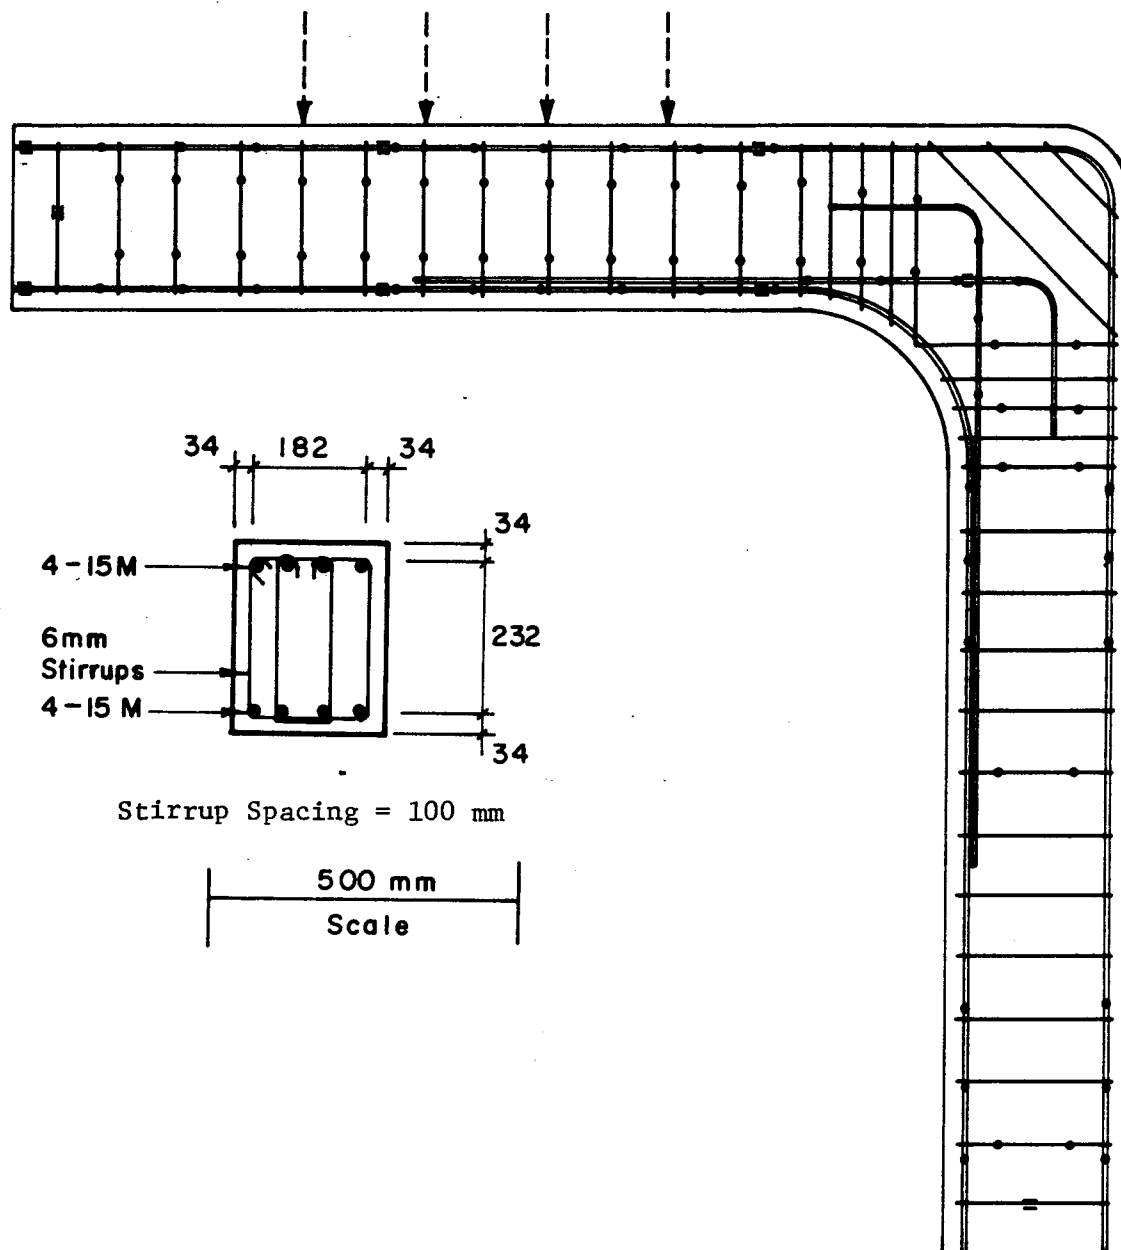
Reinforcing Layout for Specimen B2 (Abutments not Shown)
